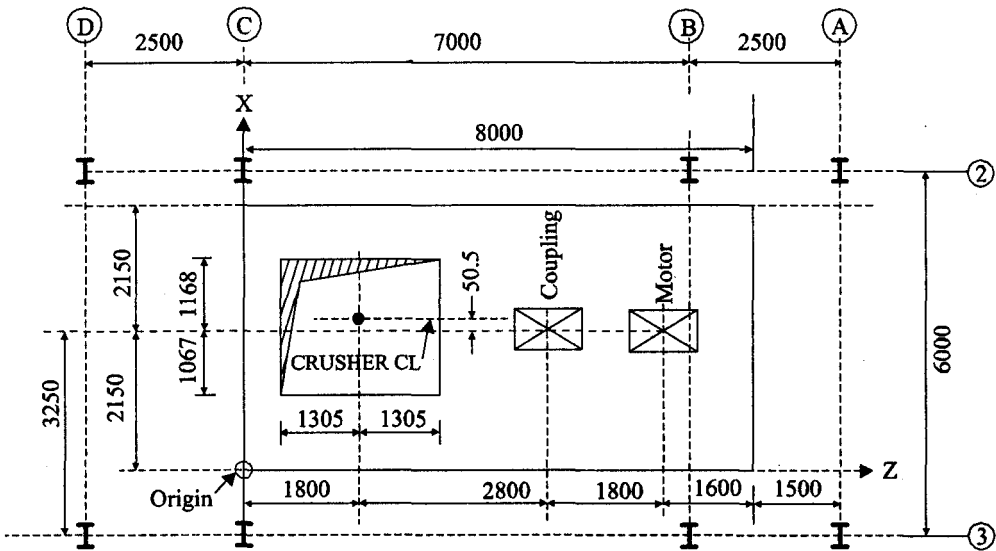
Crusher Foundation Supported over Steel Structure @ Elevation of 12.75 m
